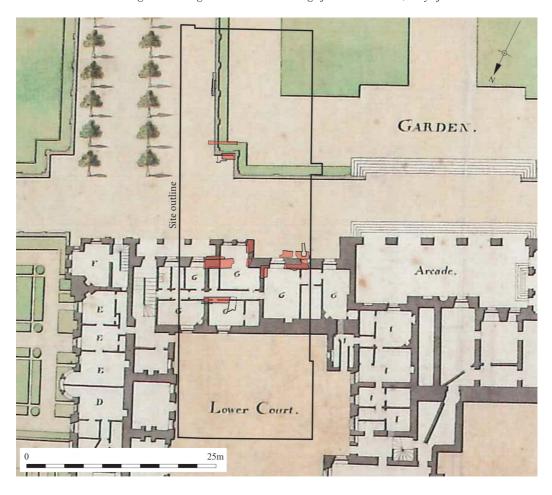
Periods 5 and 6 palace walls overlain on Kenton Couse's basement storey plan of 1775, north is towards the bottom of the plan (scale 1:500) (The National Archives, ref WORK30/260)
